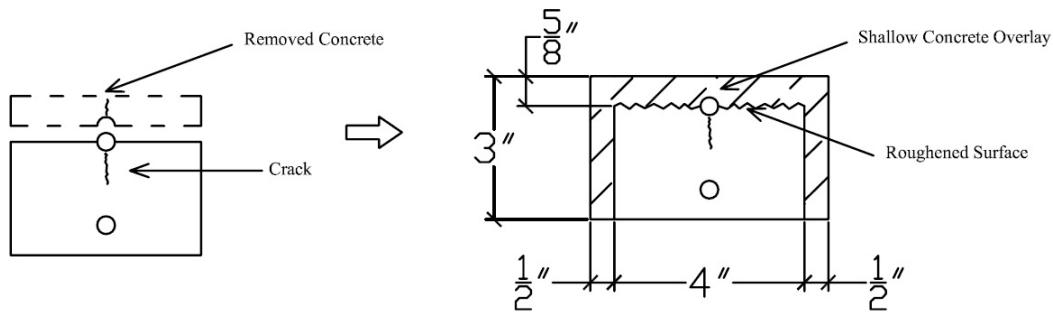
Oversized Shallow Concrete Overlay (all units in inches)
